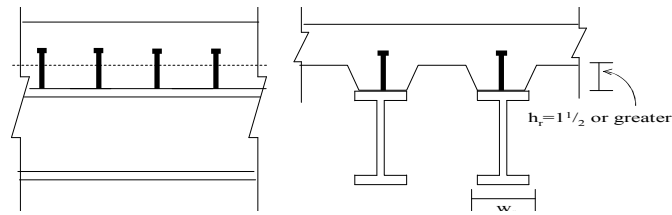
Composite Beam with Deck Rib Parallel to Beam
